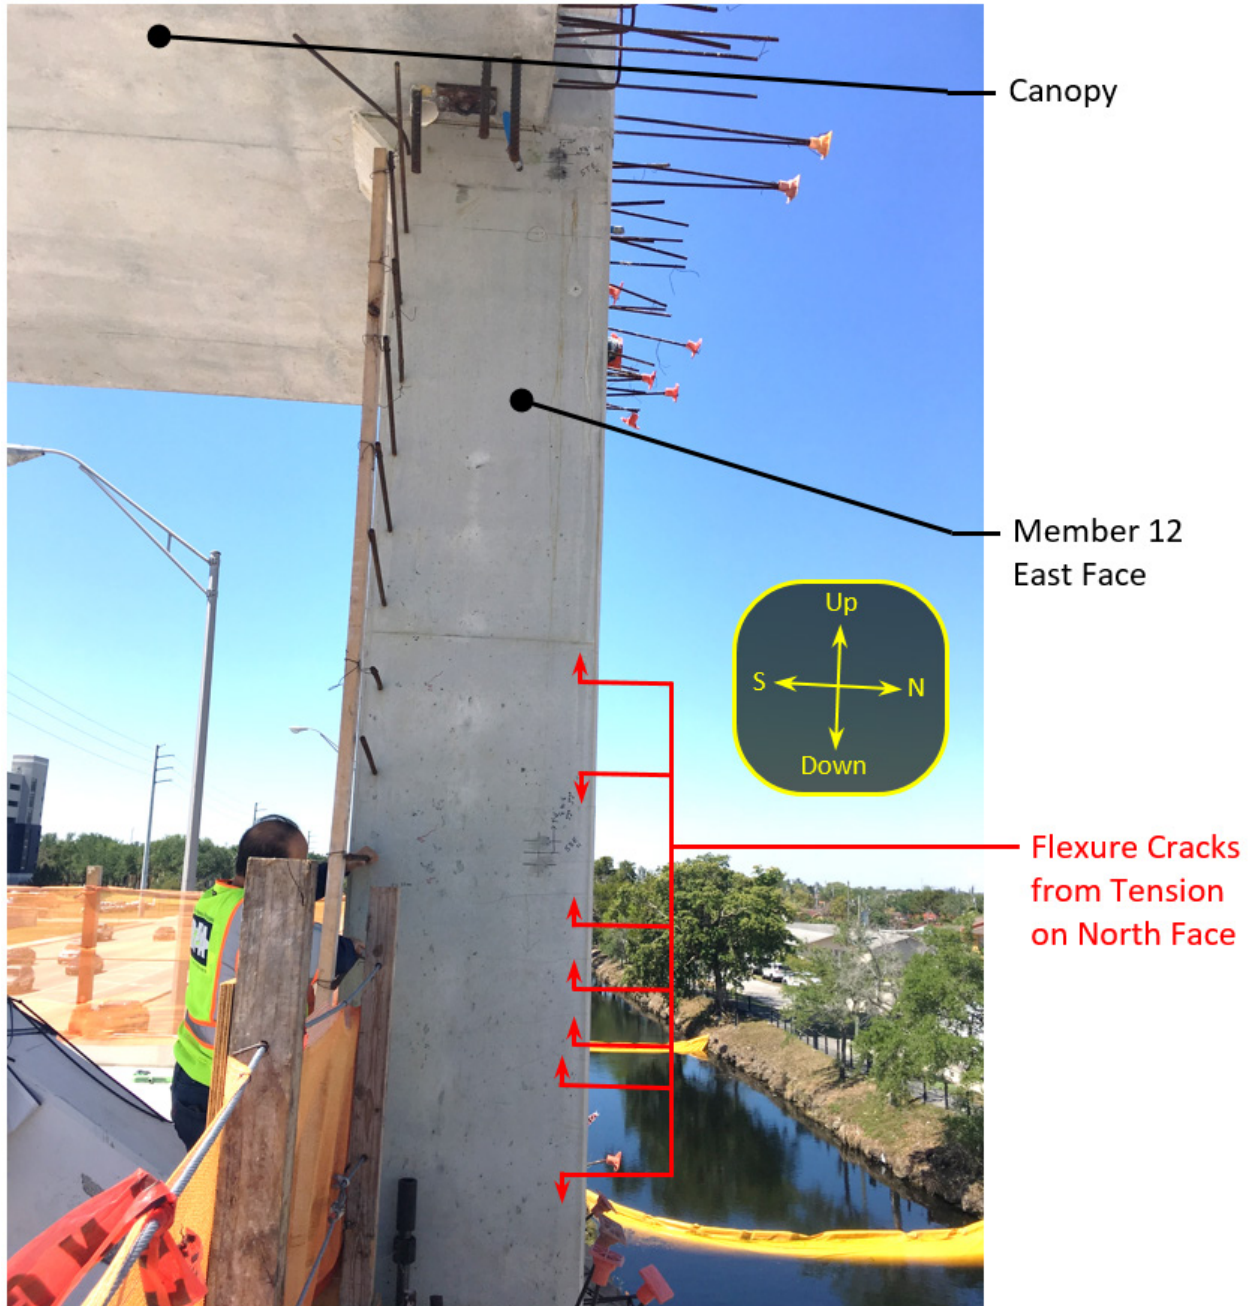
Photograph showing the east face of truss member 12 on March 13, 2018 at 1:21 p.m.
